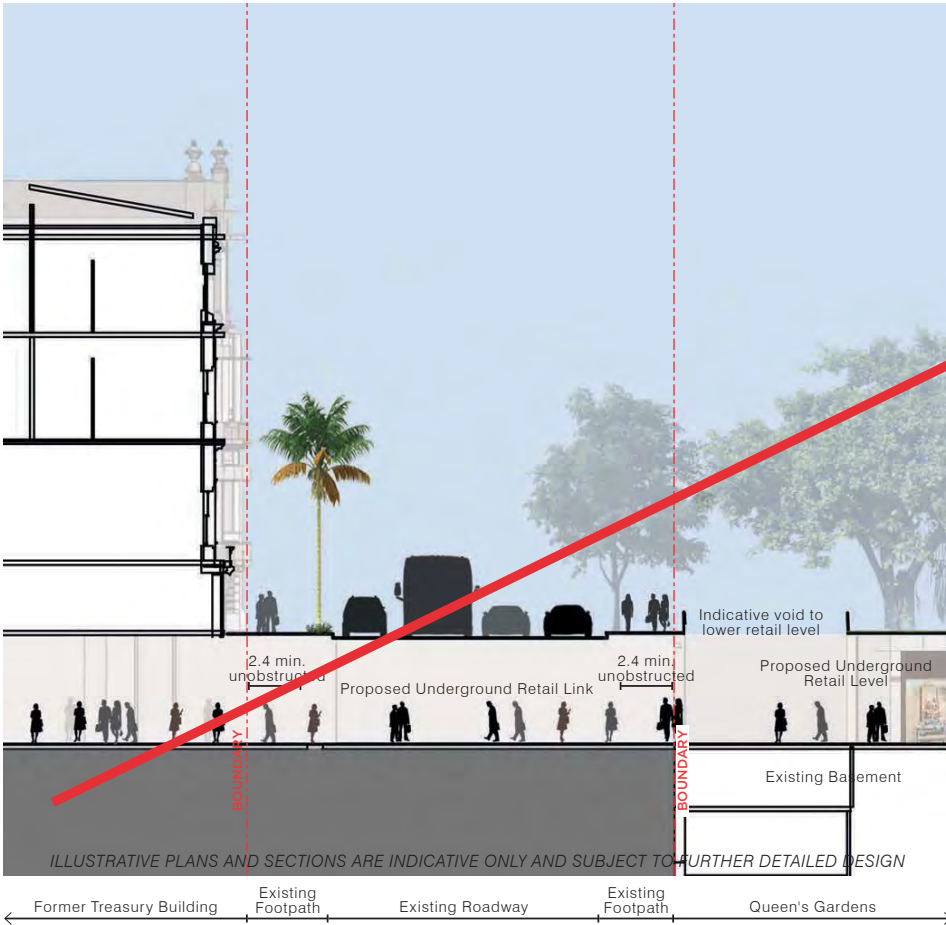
Elizabeth Street sectional elevation at Centre of Queen's Gardens and former Treasury Building
